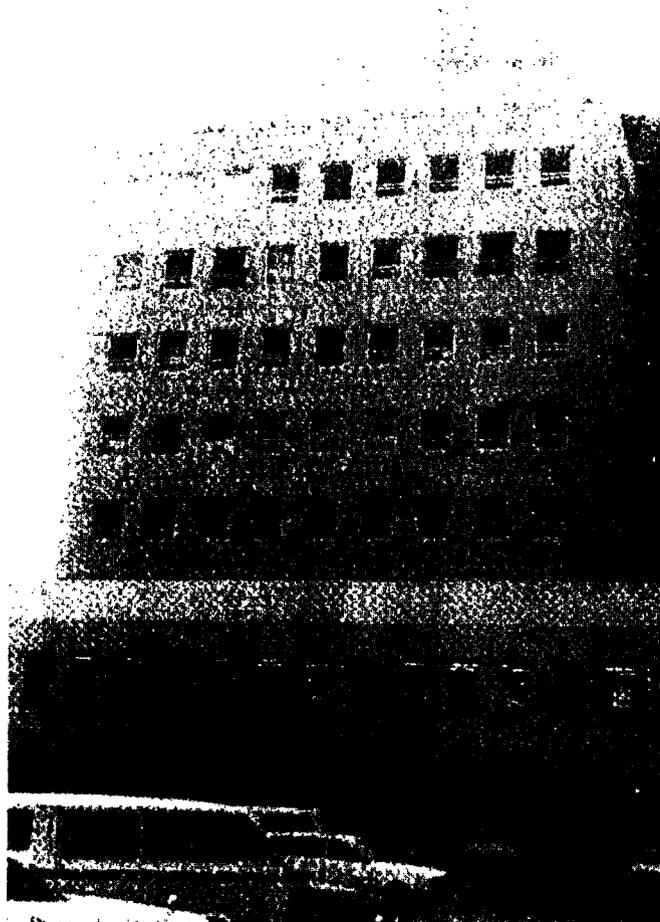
A slightly damaged 9 story building in the Oroshicho area of Sendai.
